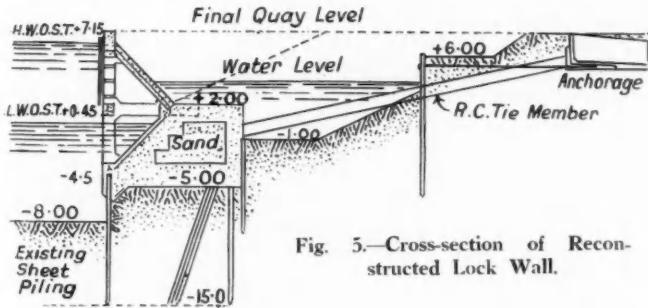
Cross-section of Reconstructed Lock Wall.
